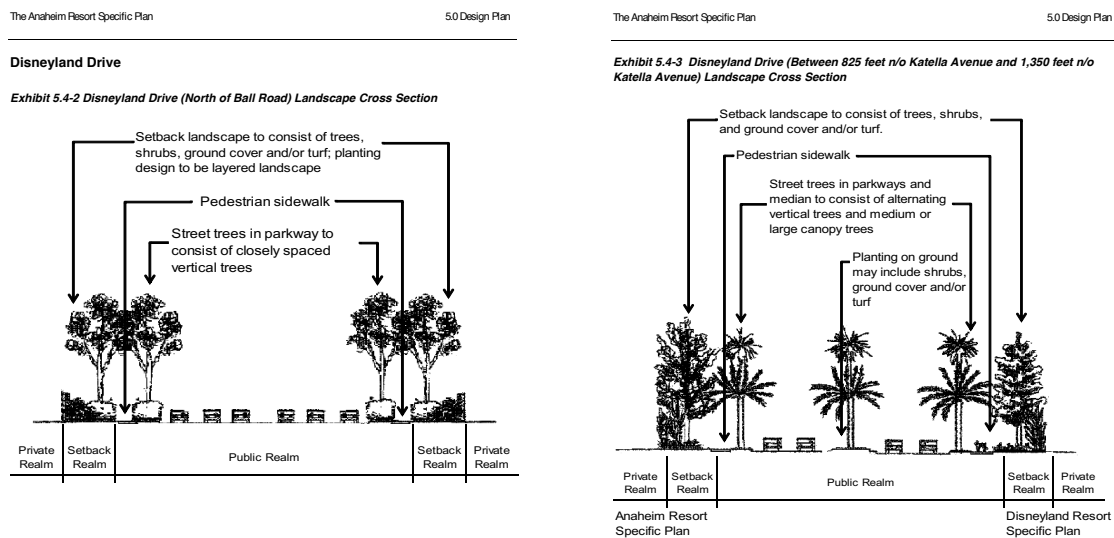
1: The Anaheim Resort Specific Plan has comprehensive street landscape plans for all roads under the plan’s jurisdiction. These landscape guides should be expanded down the Katella corridor.
